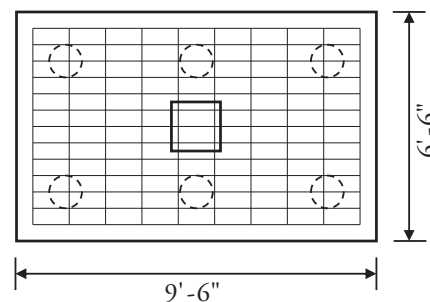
Reinforcement Summary for design example #3: Use 10 #9 bars (short); Use 13 #8 bars (long)
